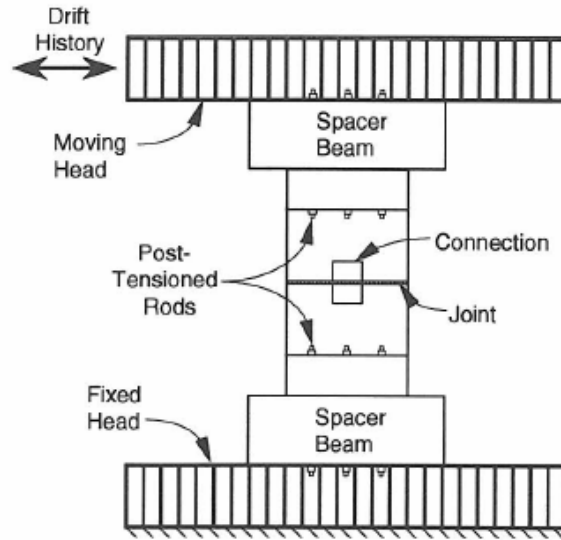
Test set-up of U-shaped Connection by PRESS [5]
